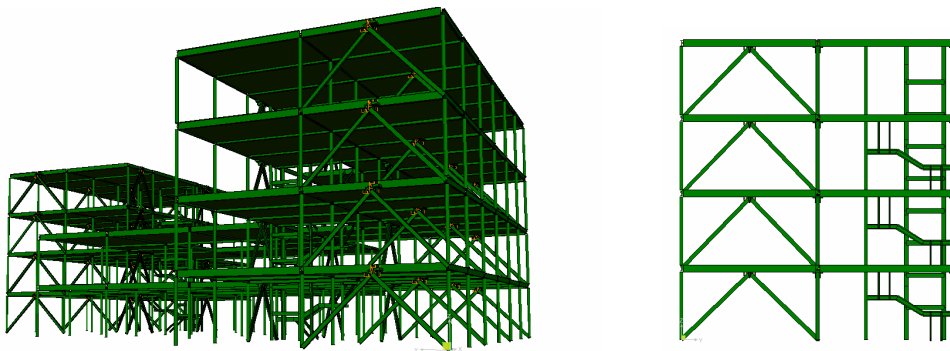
Global View of the Finite Element Model of the DB-Retrofitted Main Building Structure, and Cross Section Over a Four-Story Wing
